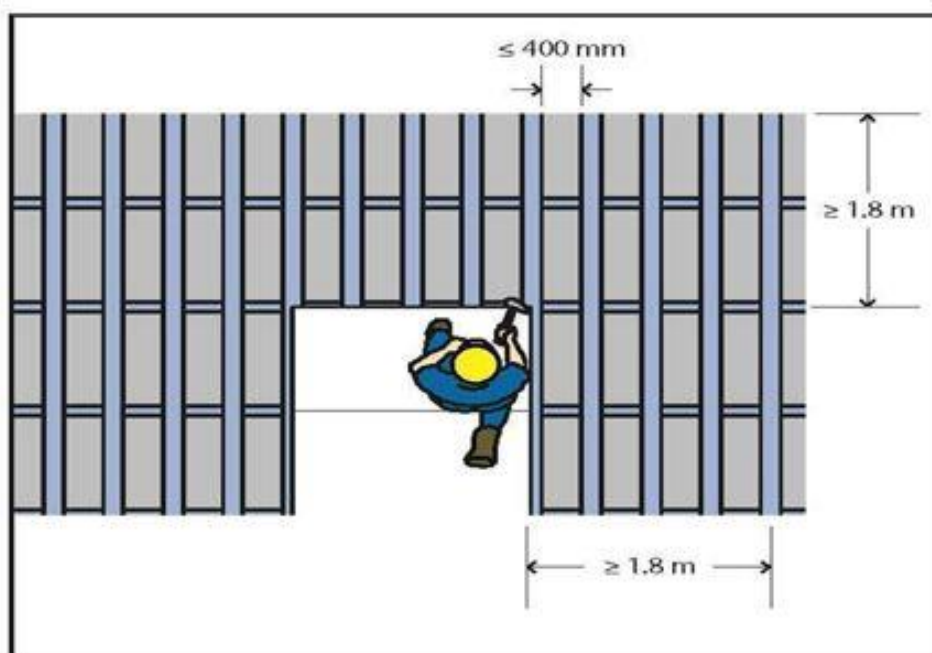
Maximum spacing of timbers where deck height is over more than two (2) metres in height from deck below.
